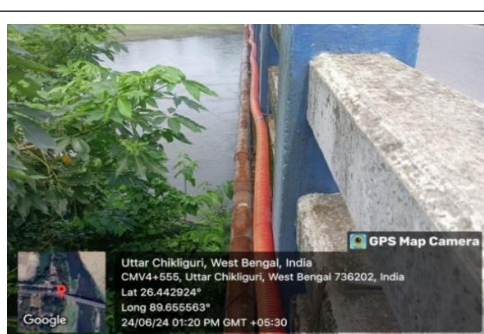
Two hosepipes hanging with the railing of Raidak Bridge at chainage 10.70 km of Alipurduar-Volka road under Alipurduar Division (PWD)
